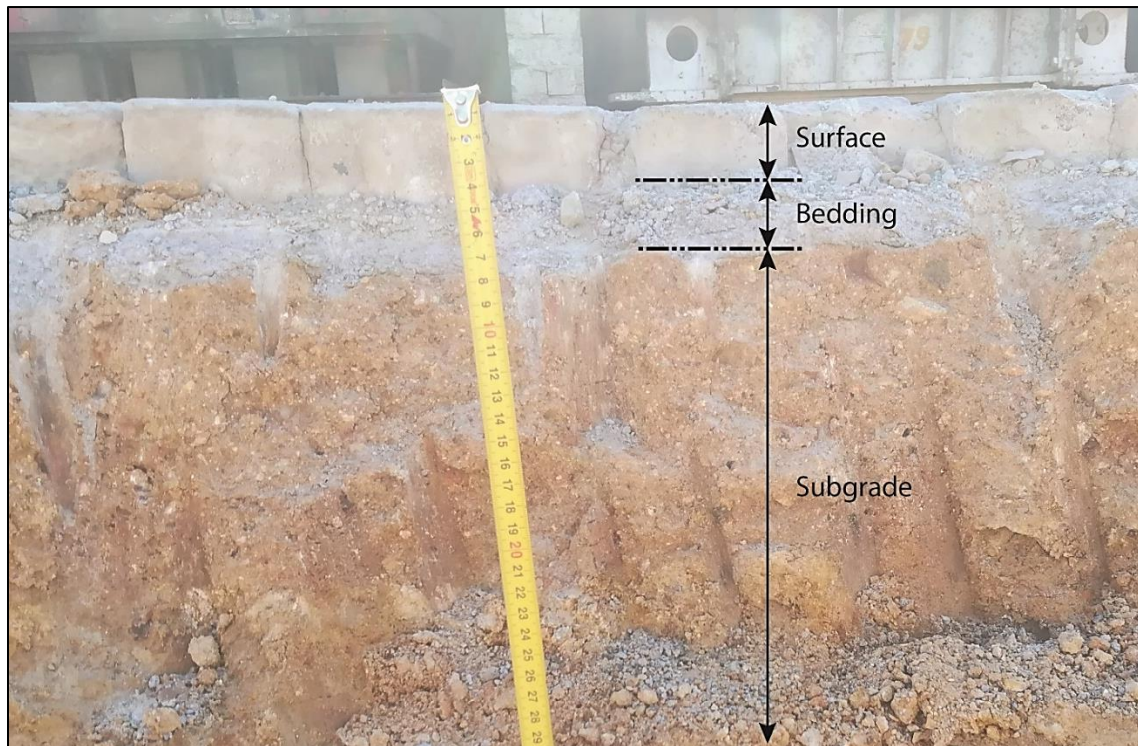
A typical Interlocking Concrete Pavement layer works (Bosun – Midrand, 2018)
